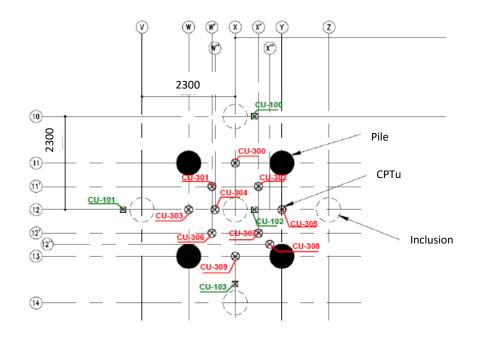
Pile and Inclusion Arrangement with CPTu Locations (Test Location 1)
